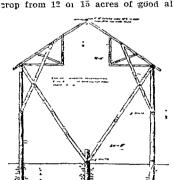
Showing Plan of Construcion of End Section, General Plan of
